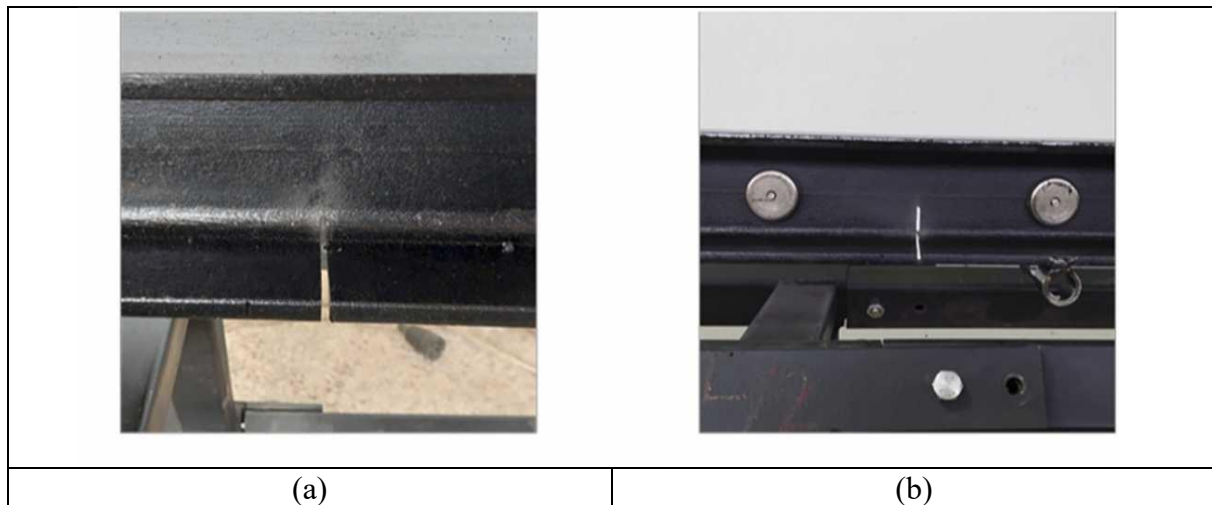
Scenario L2 for artificially induced vertical crack damage at the center of the HEB100 steel beam. (a) minor damage, (b) severe damage.
